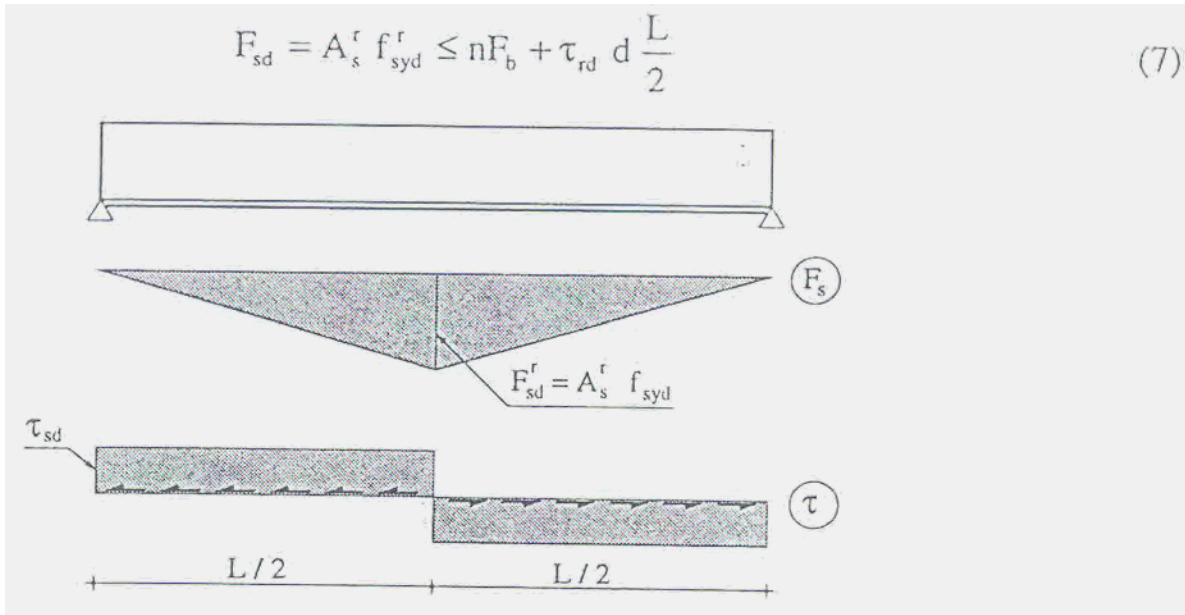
Distribution of bond stresses in the steel plate connection to the concrete.
